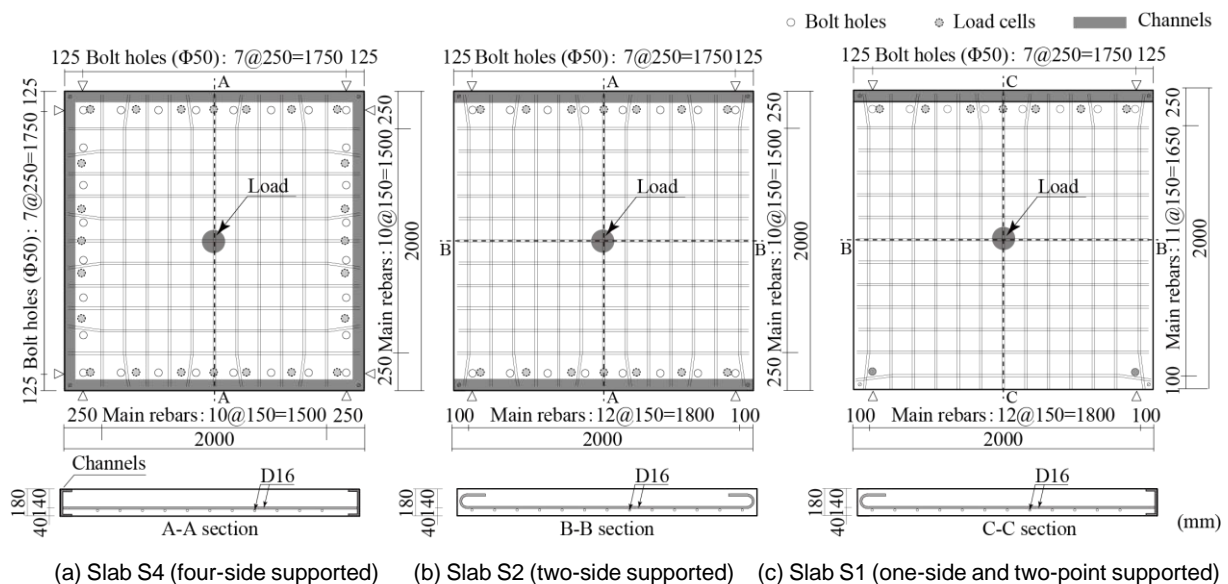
Dimensions and reinforcement layouts of rectangular RC slabs
